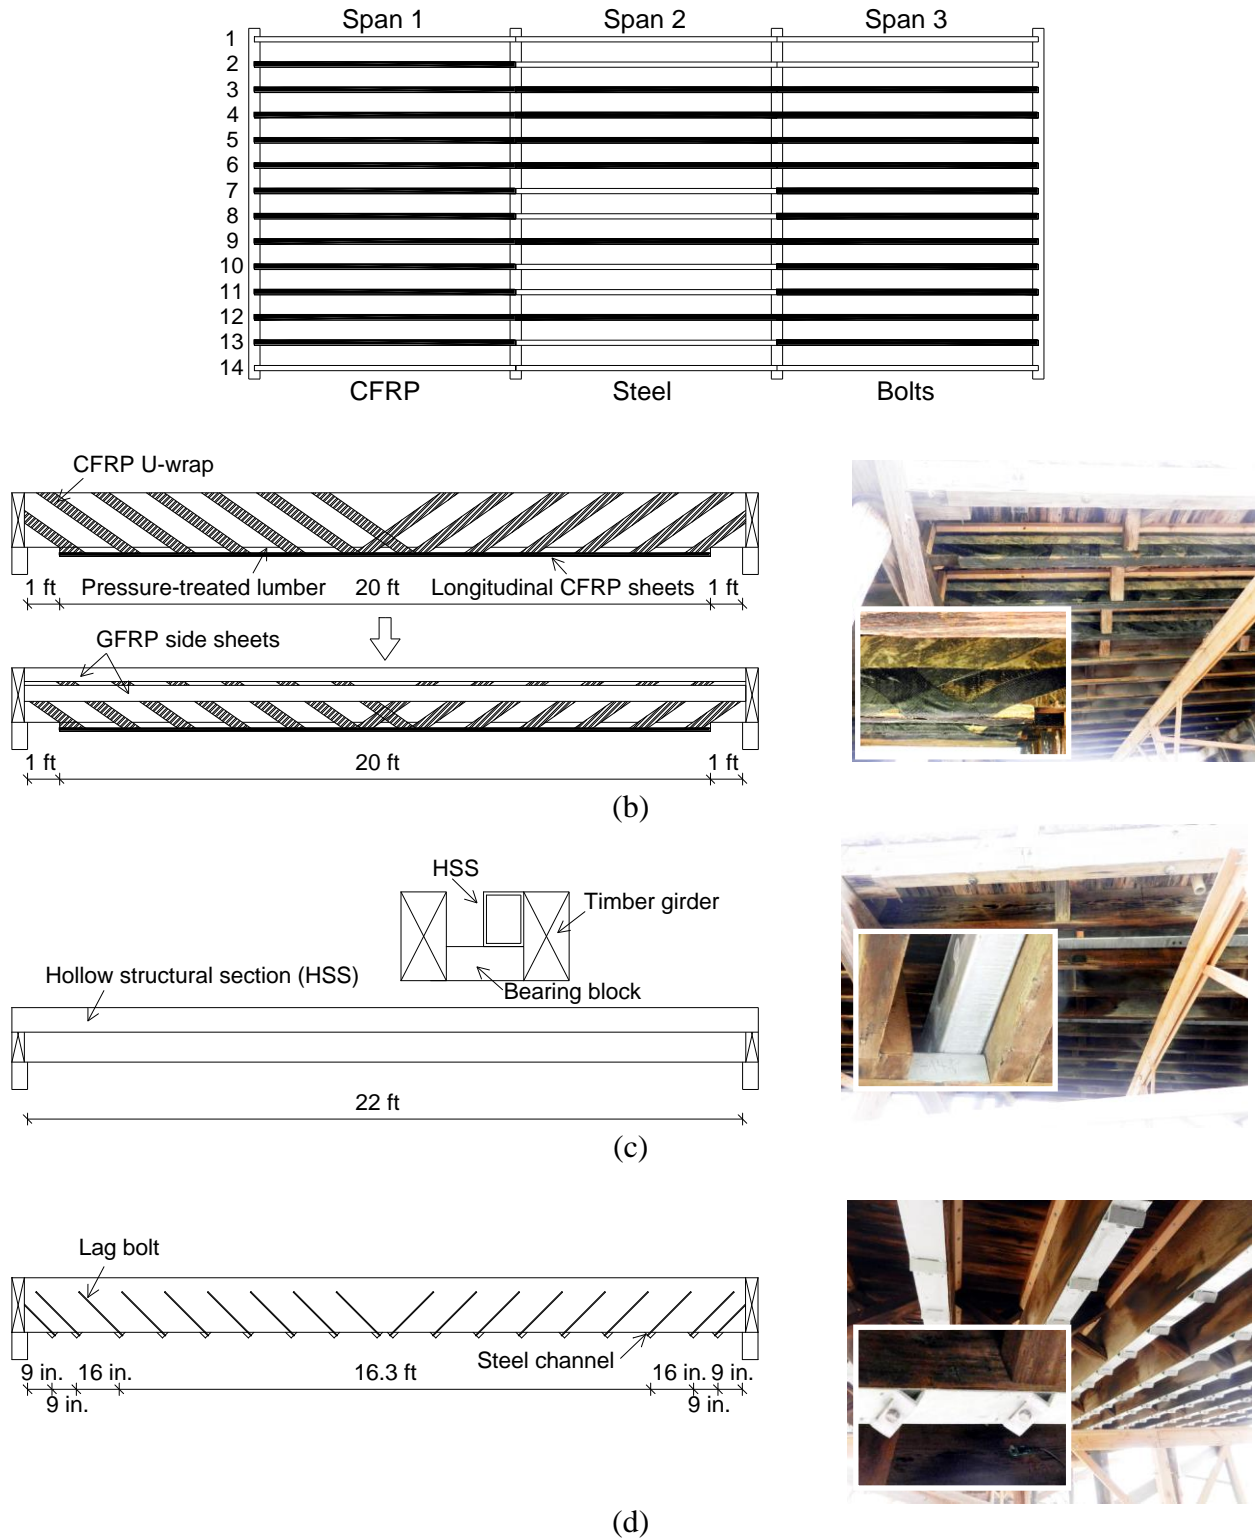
Strengthening methods: (a) plan view of girders (solid = retrofitted girder); (b) CFRP sheets; (c) HSS beams; (d) lag bolts
